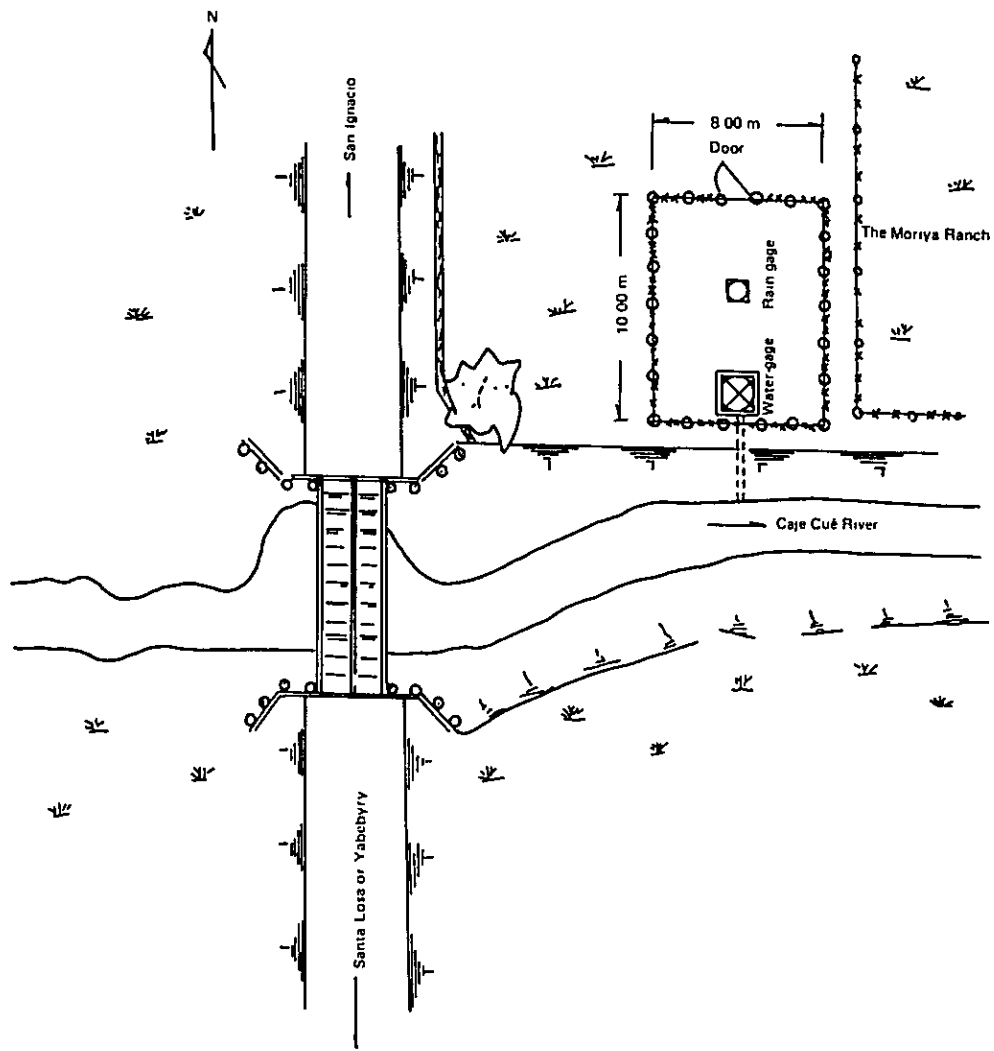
Location of Water Gage Installation at the Cajé Cué River
